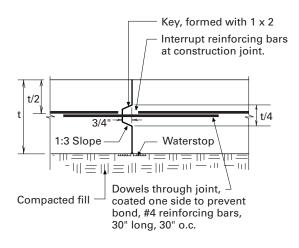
Floor construction joint with waterstop at bottom (wet joint).
